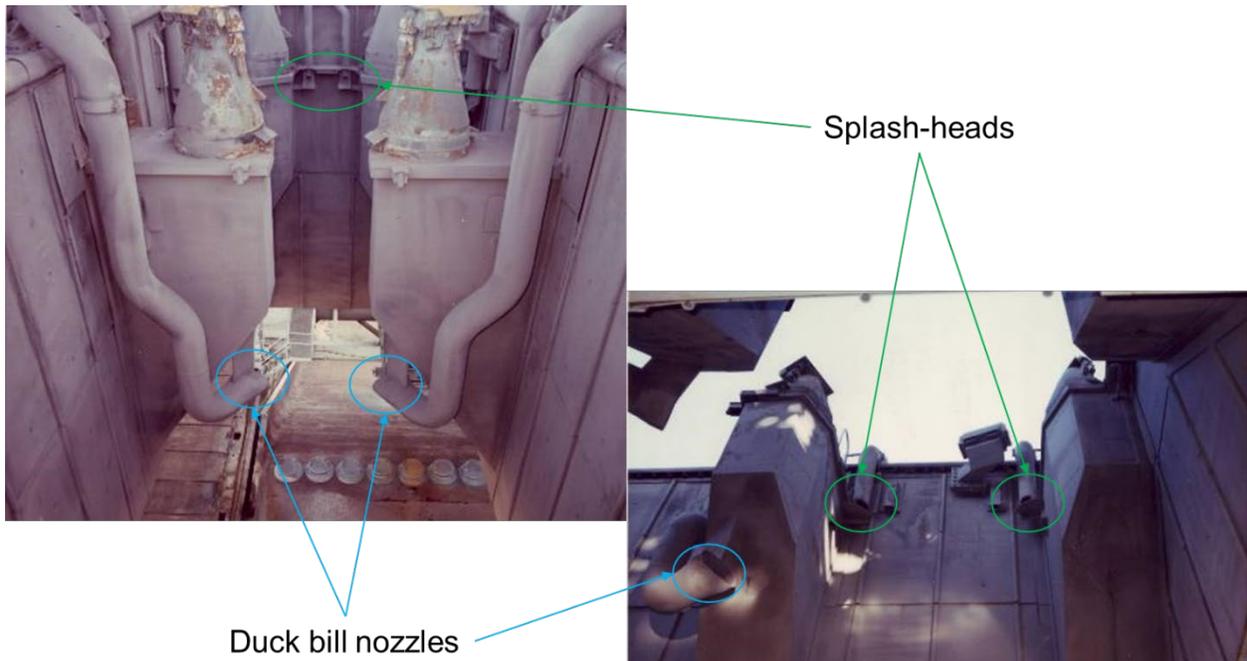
STS-2+ Booster Exhaust Hole IOP Nozzles.
